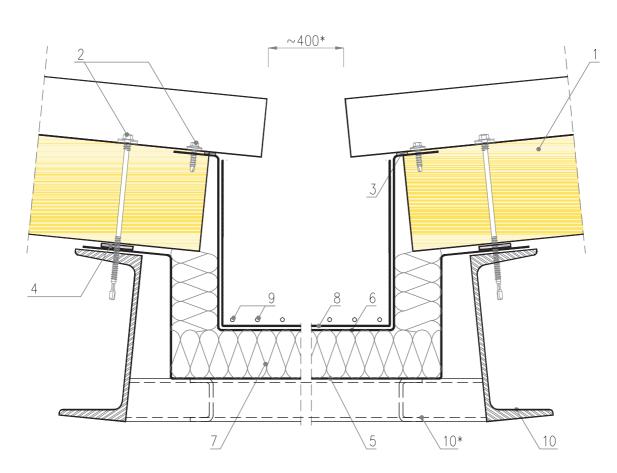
IzoRoof PIR/PIR+; MWF; EPS - internal gutter at the joint of roof panels
